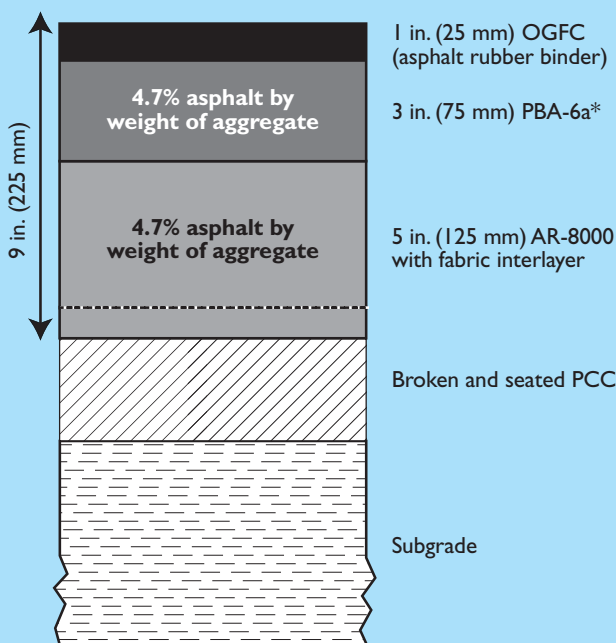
Proposed design for overlay on cracked and seated existing portland cement concrete structure.
